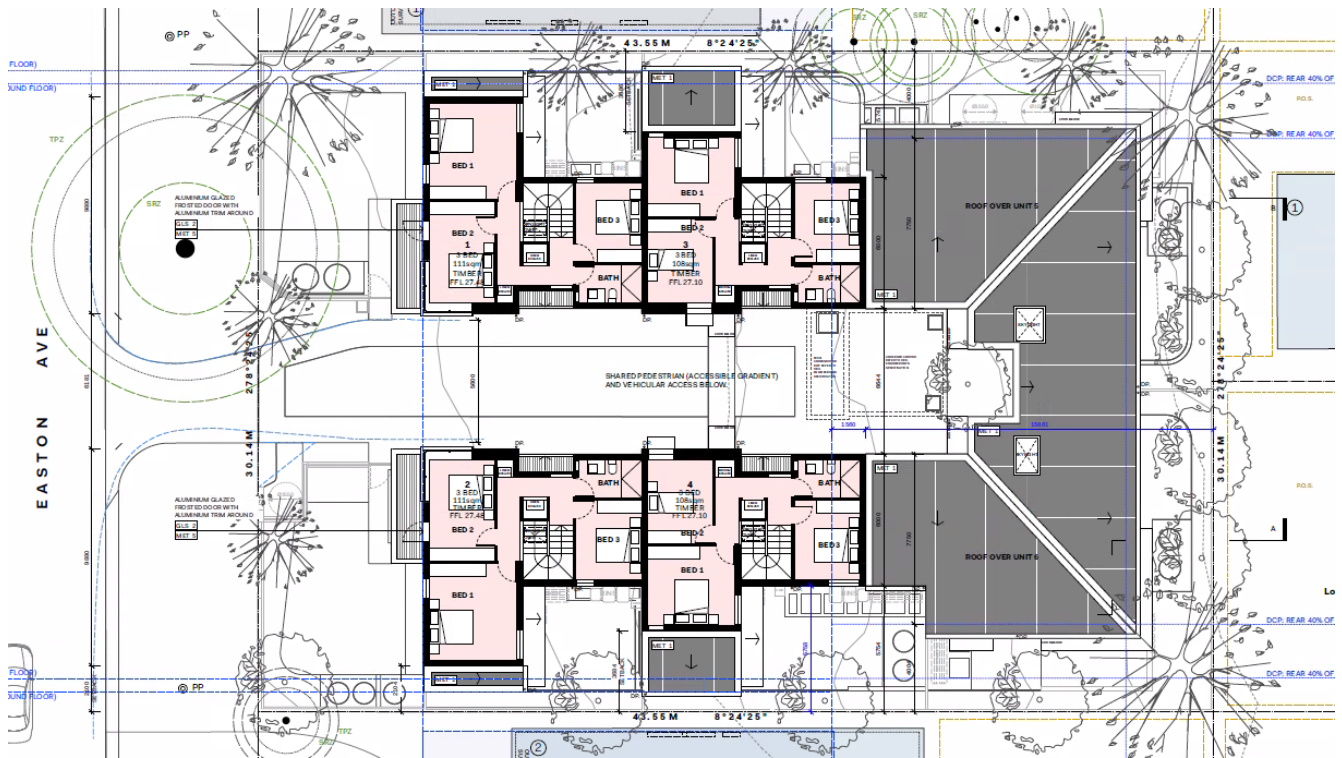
Extract from Architectural Plans (first floor) (Source – Carter Williamson, dated 10/01/2023)
